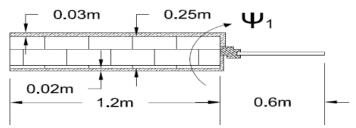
Coupling detail of exterior wall and window joinery in horizontal section
